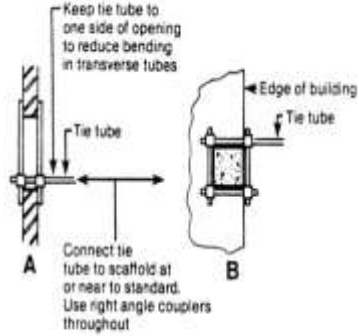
Box tie. A. Vertical or horizontal section through wall.
